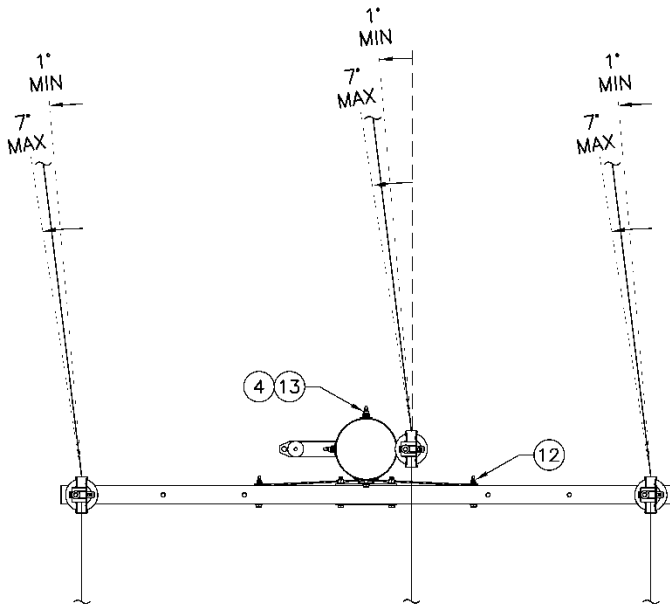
Three-Phase 397.5 and 954 kcmil ACSR Single Arm Angle Pole Top Assembly
